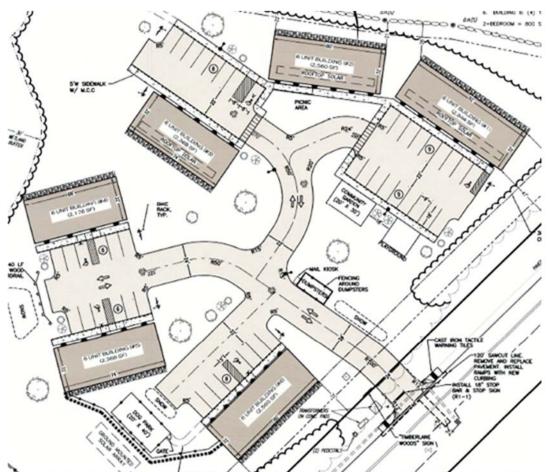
A snippet of the proposed conditions plan showing the layout of the Timberlane Woods Cottage Court Development.
